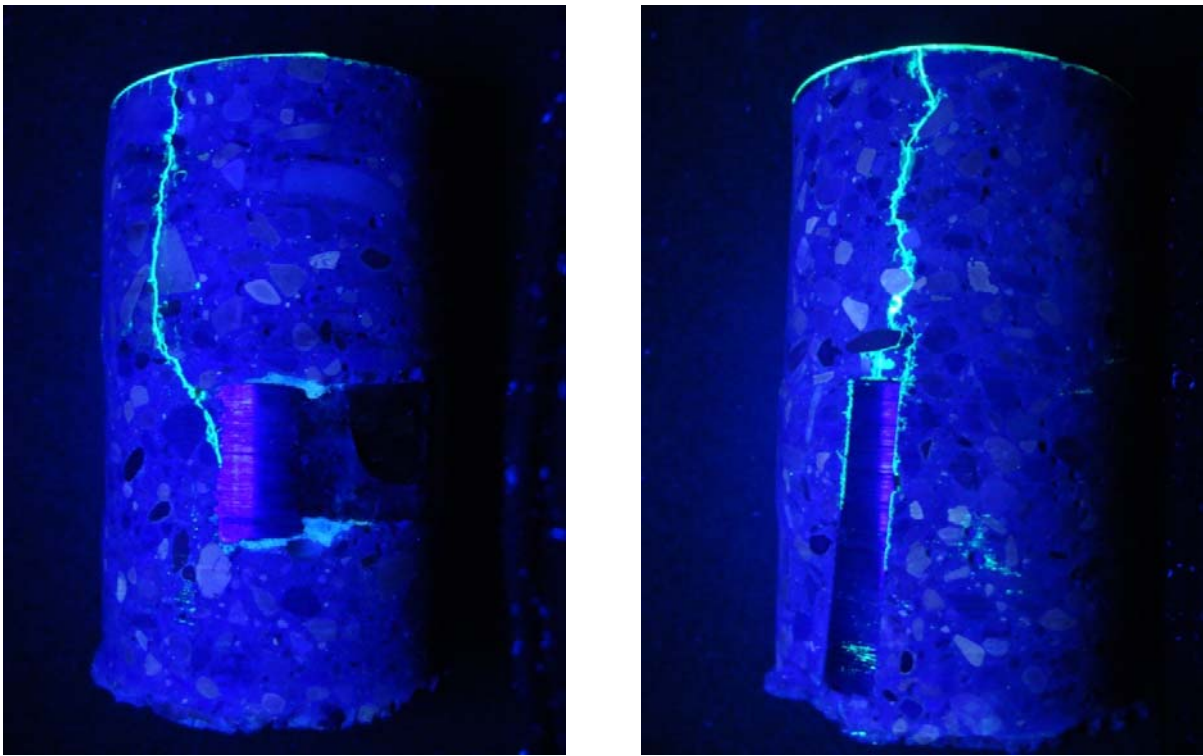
Core STS1 (left) northwest elevation; (right) southeast elevation
